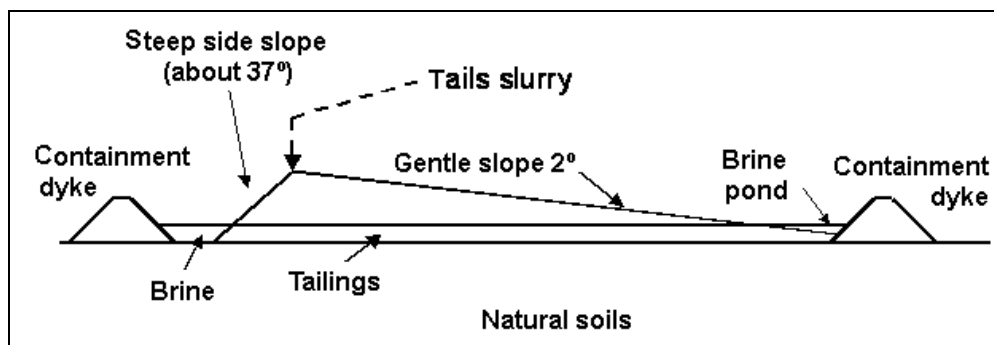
Typical cross-section of Canadian tailings piles (schematic)
